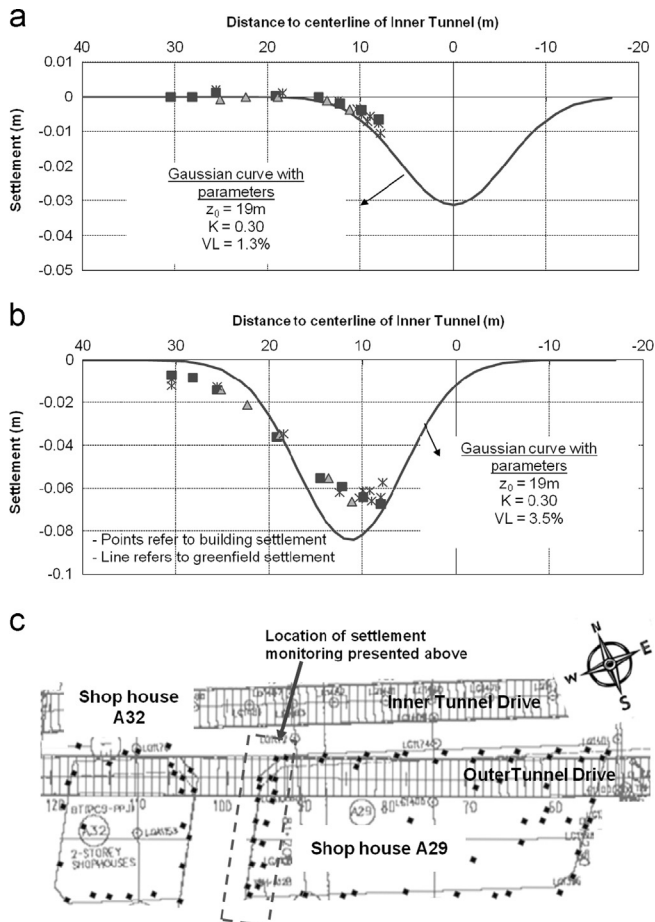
Greenfield and building settlement at west end of shop house A29 (a) Settlement due to inner tunnel drive, (b) Settlement due to outer tunnel drive and (c) Layout of building settlement markers.
